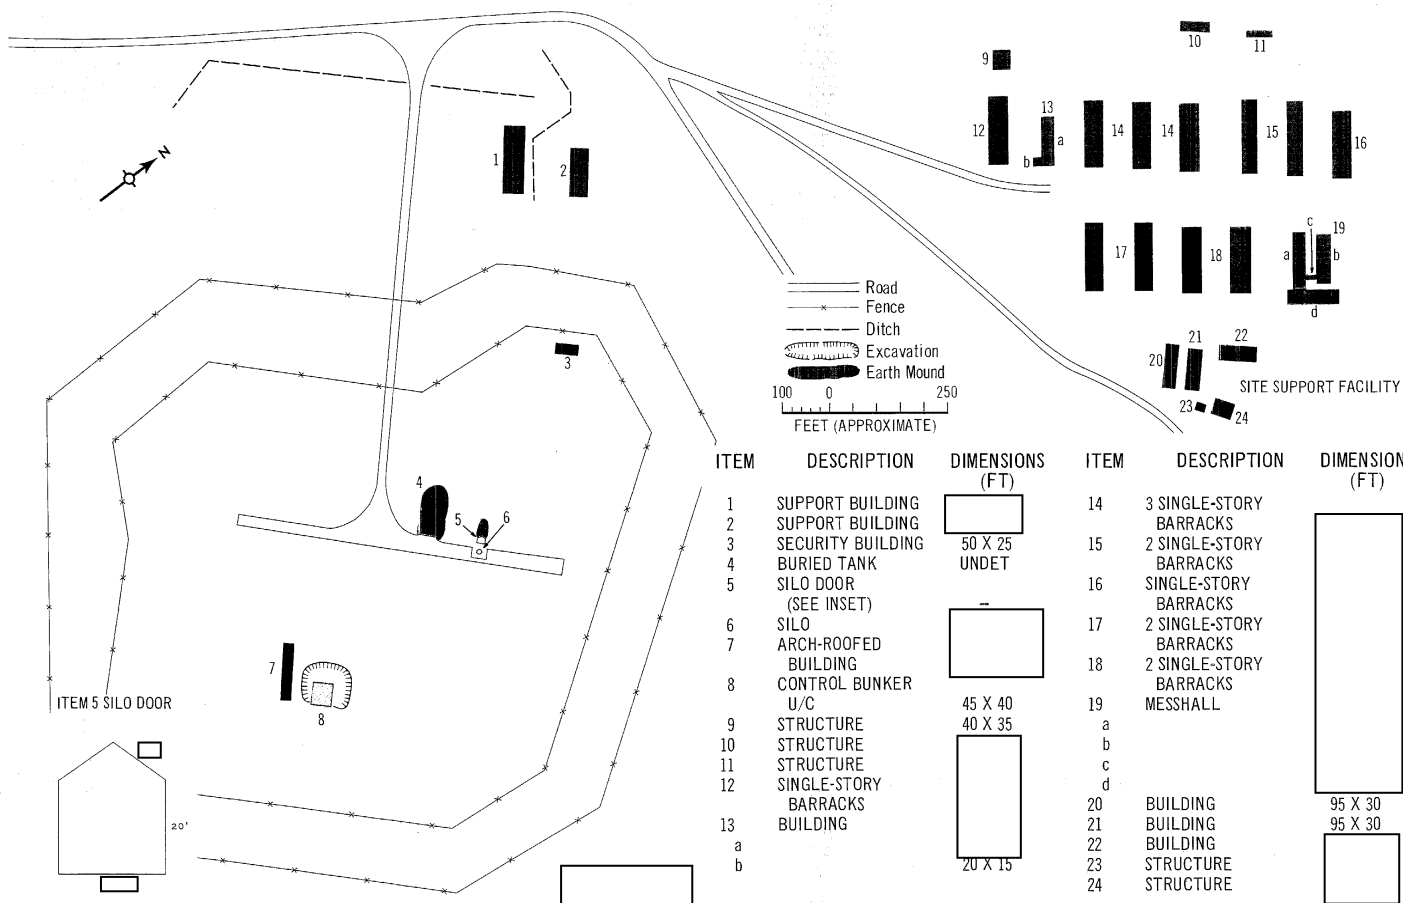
LAYOUT OF LAUNCH SITE 551, OLOVYANNAYA ICBM COMPLEX.
